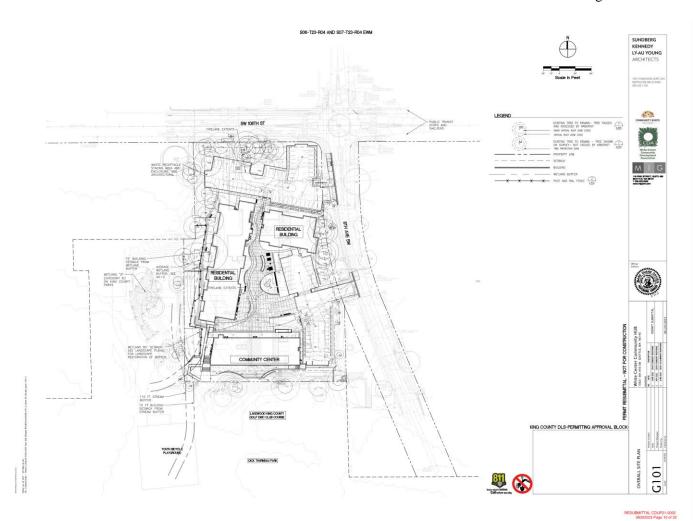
A : Reduced CUP Site Plan Sheet G101, Received August 30, 2023
